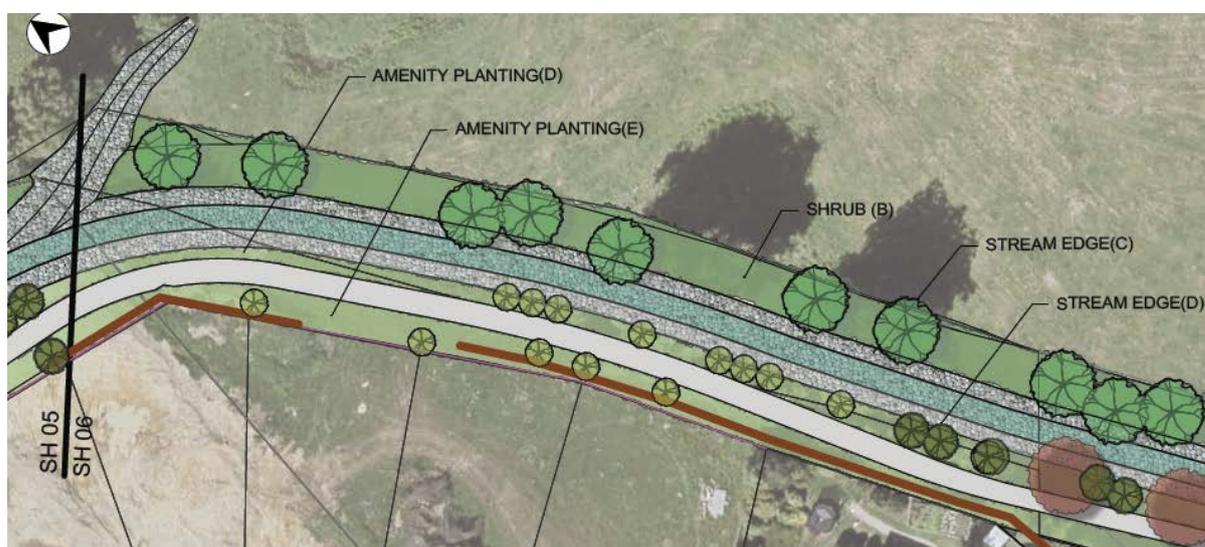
Extract from Landscape Plan – portion of Stage 3B section (see Annexure B: Appendix 3 for detail)
